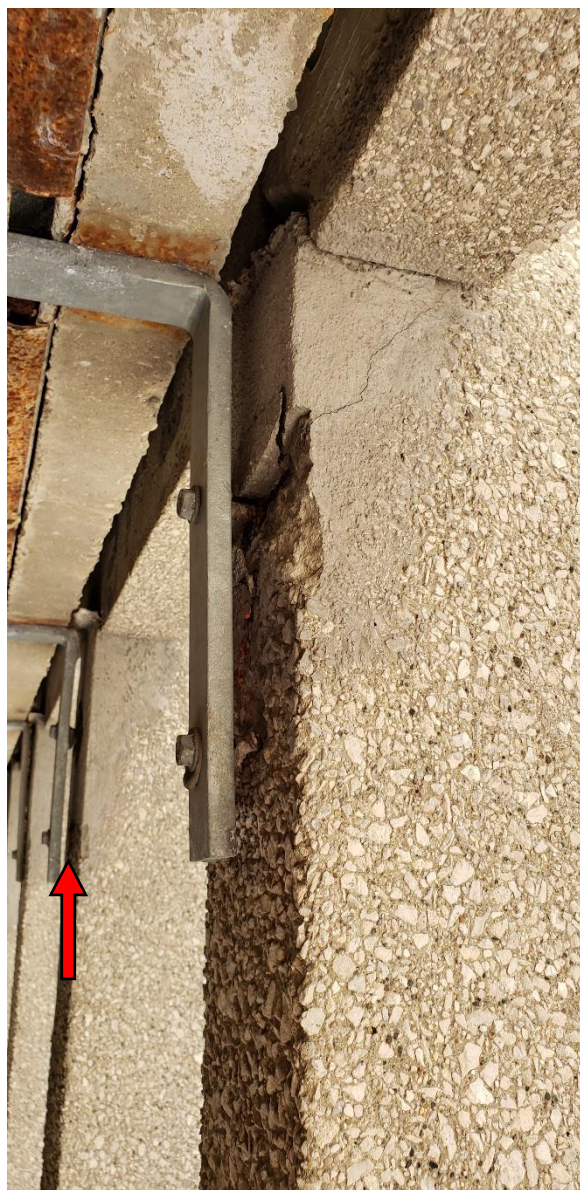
Spall at the nearest top connection of a precast panel. Note the loose bolts at the nearest connection and the fractured bolt at the connection beyond (indicated by the arrow).
